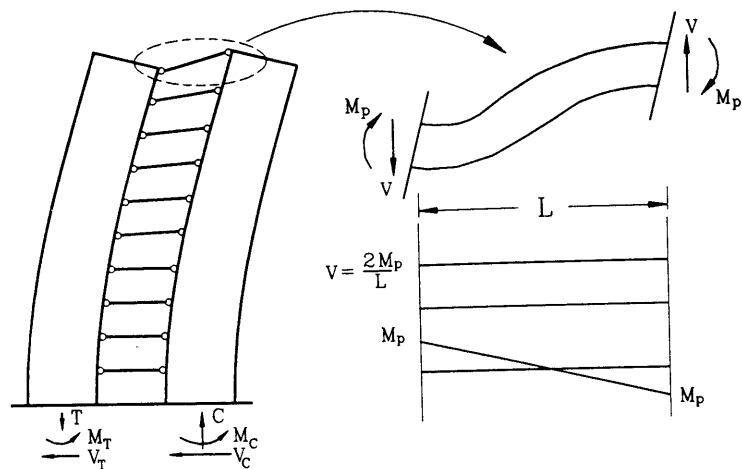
Influence of Coupling Beams on Wall Axial Load
